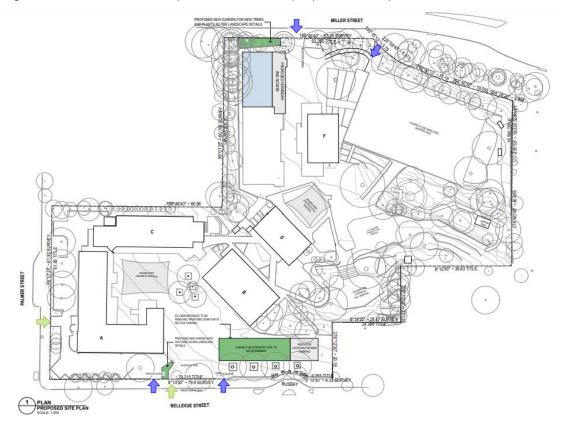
Proposed Scope of Works (Source: Fulton Trotter Architects, Proposed Site Plan (Rev 6))
